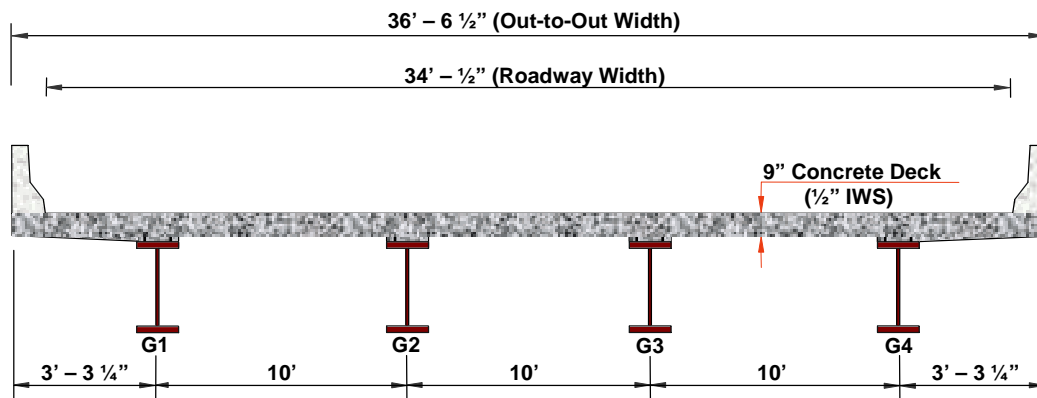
Bridge Cross-section with 34-ft. Clear Roadway Width
